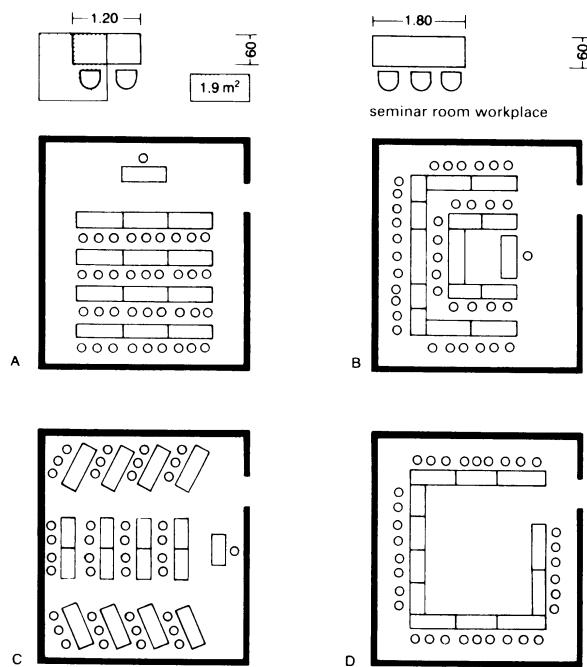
seminar room furniture arrangement and furniture dimensions.
